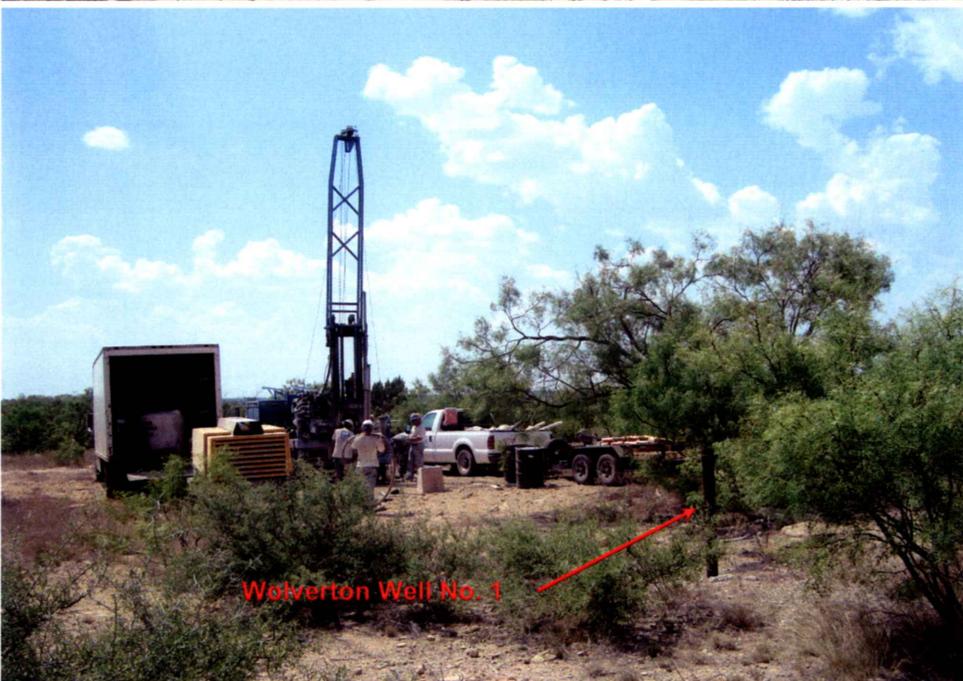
View to the northwest of the installation of monitor well MW-5 located adjacent and down-gradient of the Wolverton Well No. 1. (photo date: 7/18/06)
